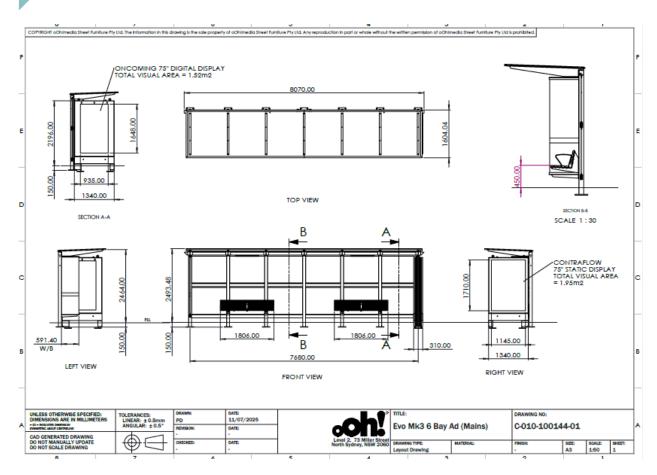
Proposed Digital/Static Signage Elevation – Evo Mk2 6 Bay
